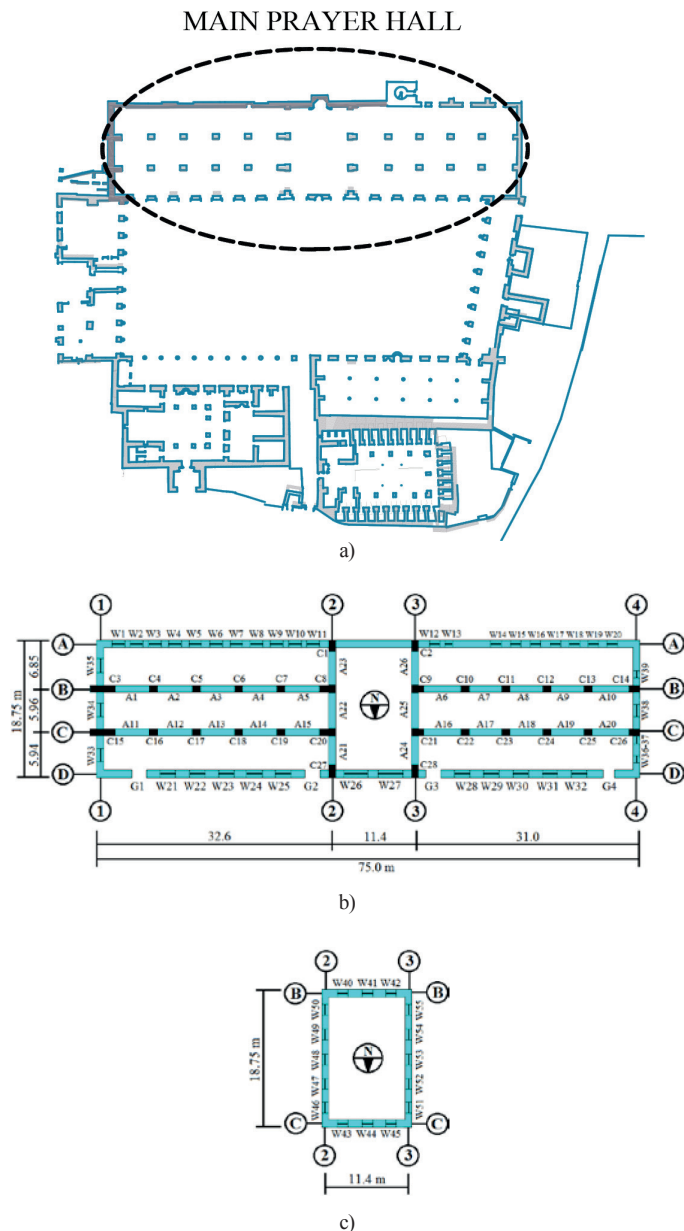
a) Plan layout of Diyarbakır Grand Mosque, b) Ground and c) first floor plans of main prayer hall.
